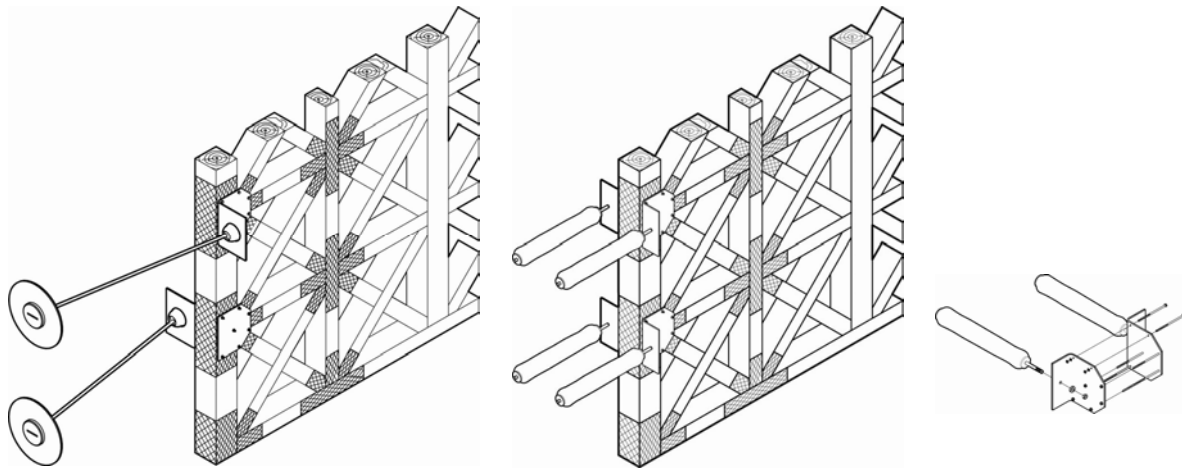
Timber braced wall strengthened with externally bonded GFRP fabric and connection devices to the main masonry walls.
